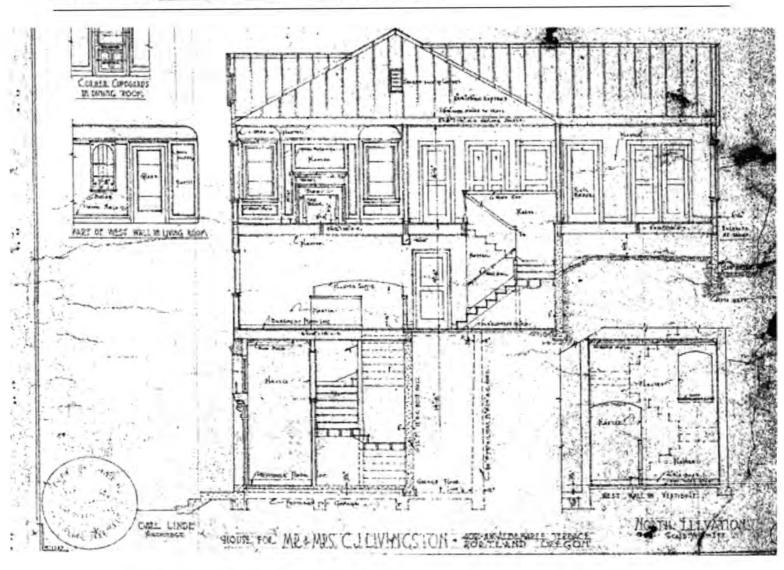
Original drawing for the C.J. Livingston House, showing section of north elevation.
